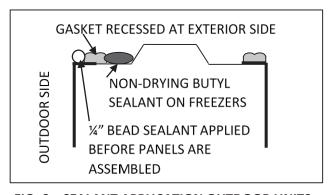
SEALANT APPLICATION OUTDOOR UNITS
